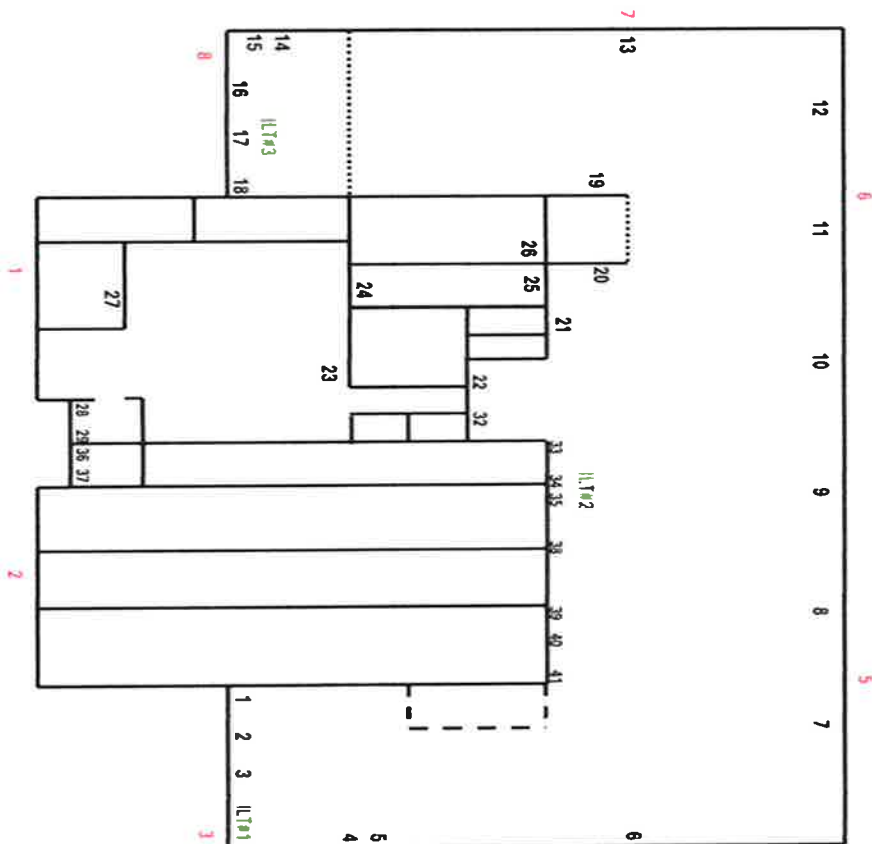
Warehouse Floor Plan with Location of Traps (Driskill)
